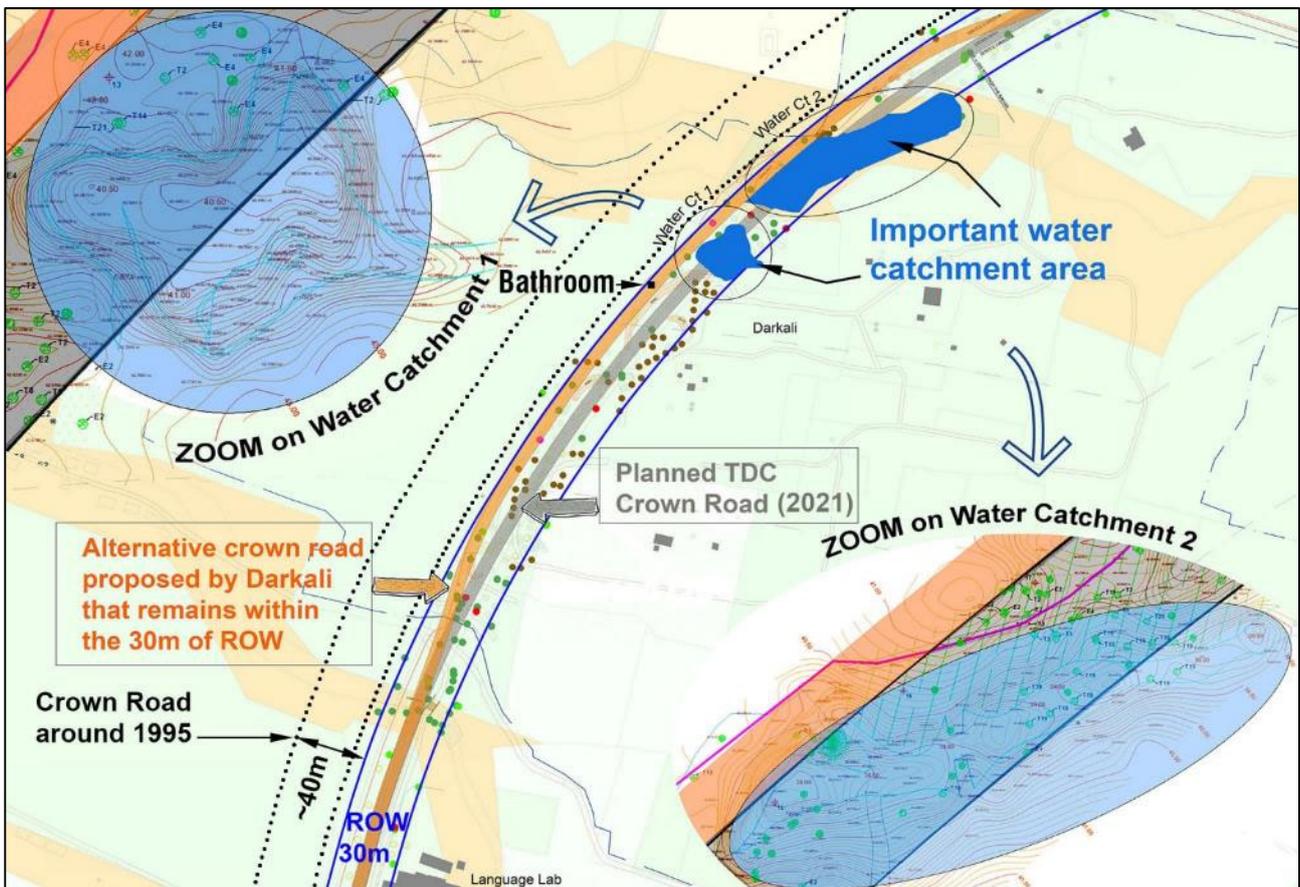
Plan of the alternative proposal made the stewards of Darkali in December 2021
